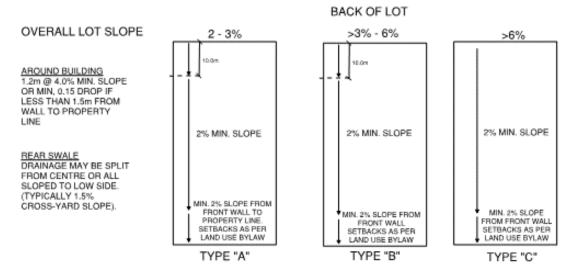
A – Typical Lot Grading Details – Rear to Front Drainage
